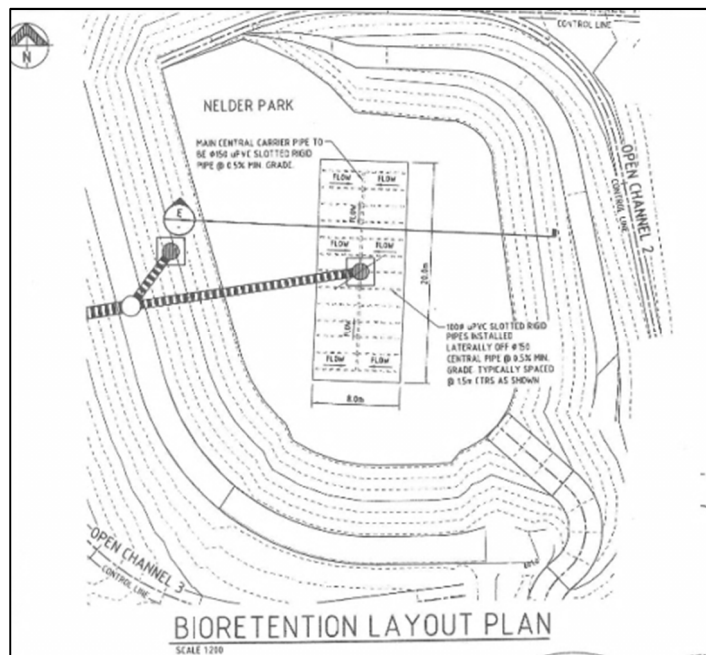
Detention basin and biofilter layout plans obtained extracted from engineering documentation prepared by RMA engineers (drawings No 101472-001 & 006 revision 2 dated 21st April 2011) ([RMA, 2011](#))
